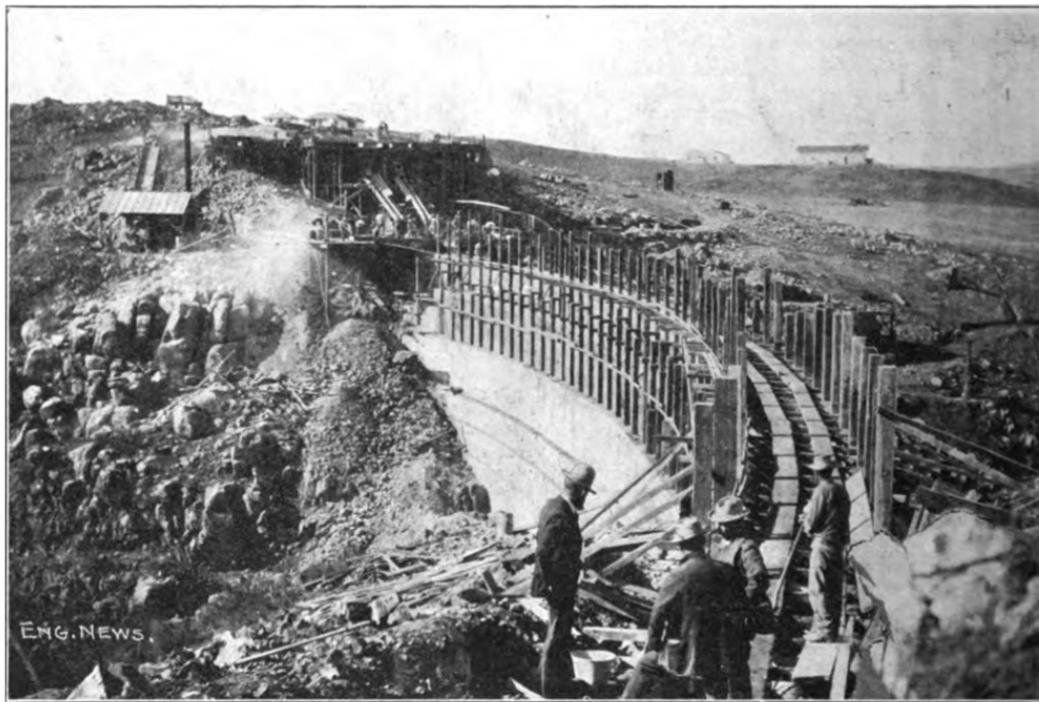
VIEW OF UPPER OTAY CONCRETE DAM UNDER CONSTRUCTION.
